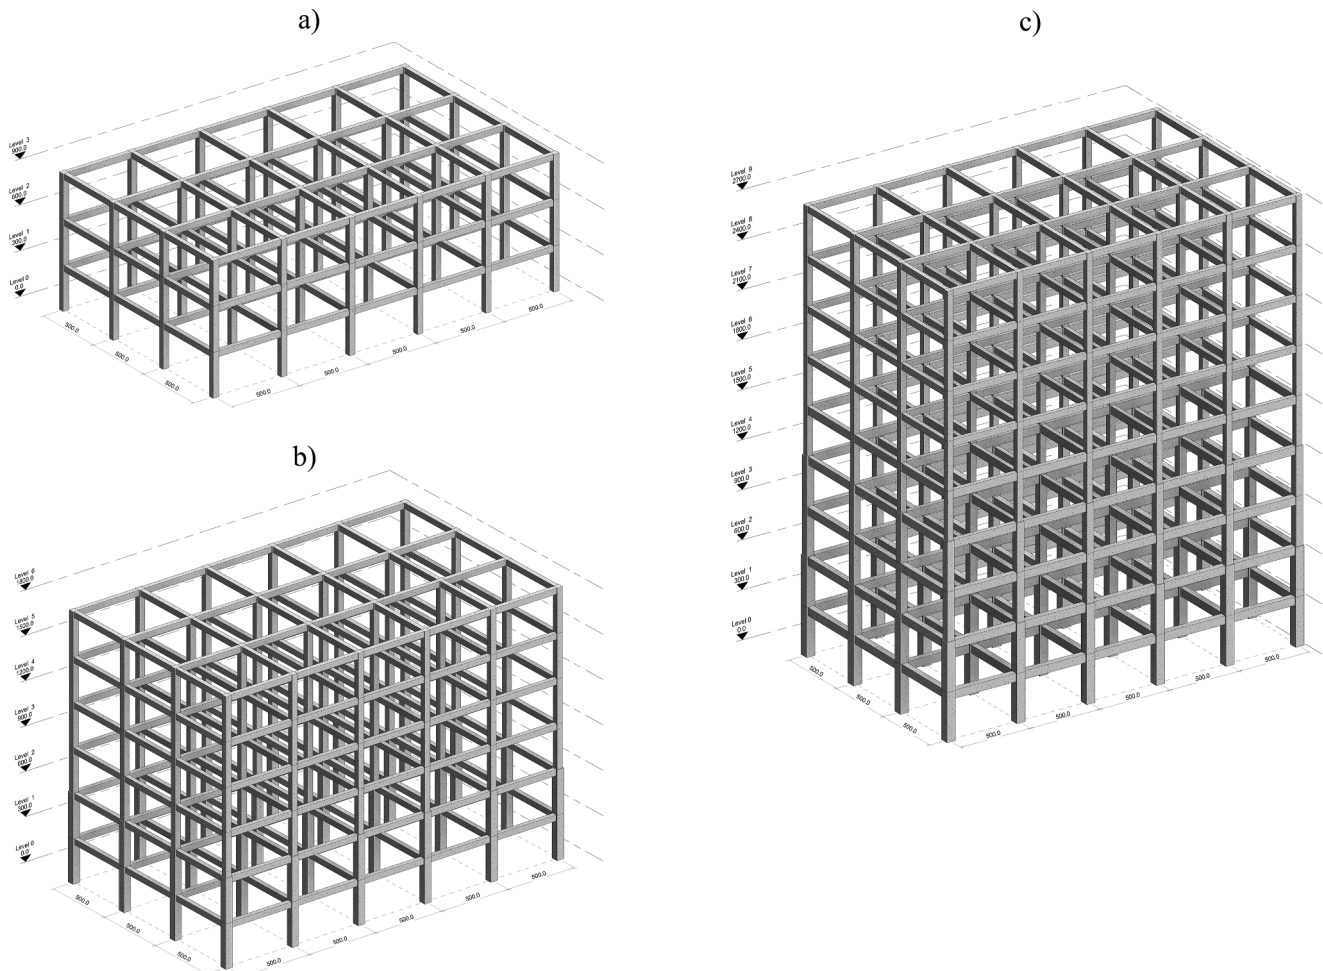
RC frame layouts analyzed: 3- (a), 6- (b) and 9-story (c) building archetypes.
